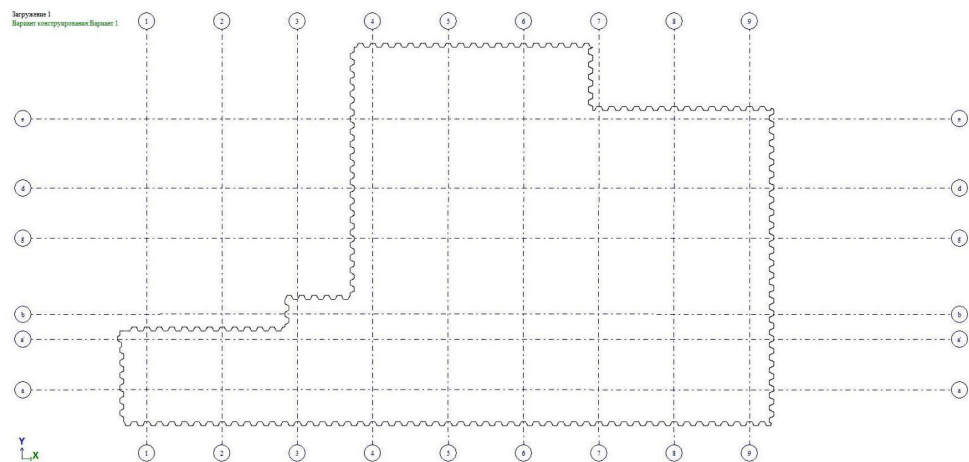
Retaining structure of the pit wall and a diagram of the interlocks
